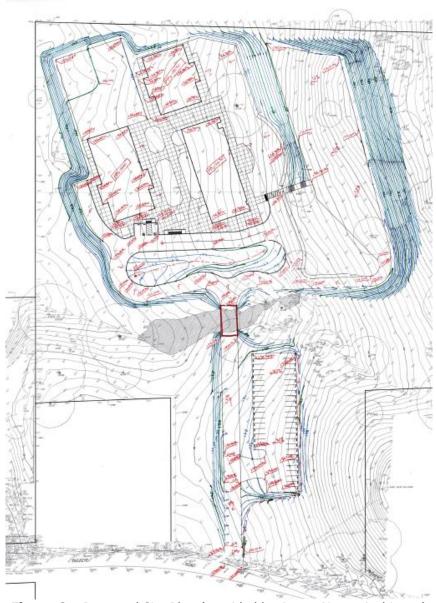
Proposed Site Plan (provided by Anova Nexus Architects)
